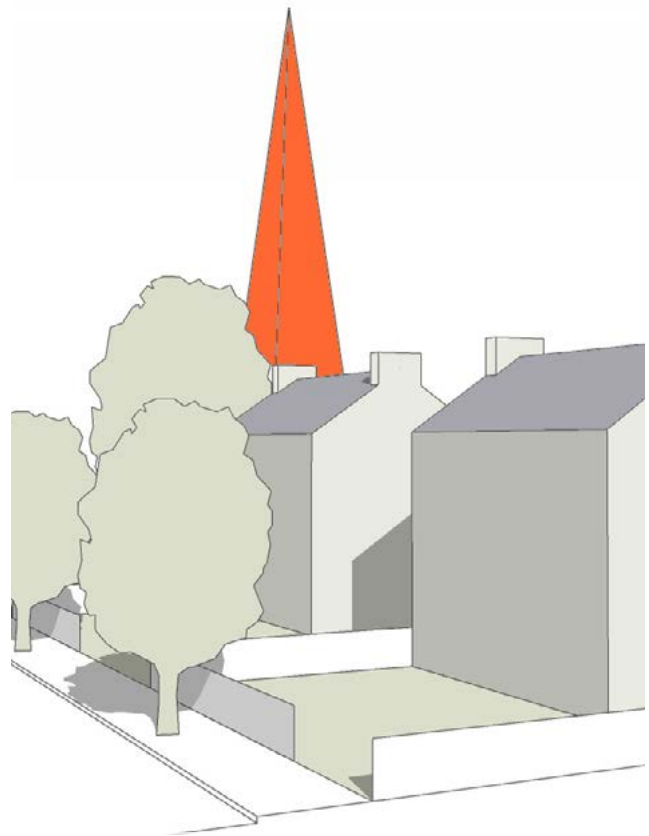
New developments should respect the existing shape and rhythm of skylines and designers should make sure that new buildings do not obstruct views to local landmarks such as Church Spires
